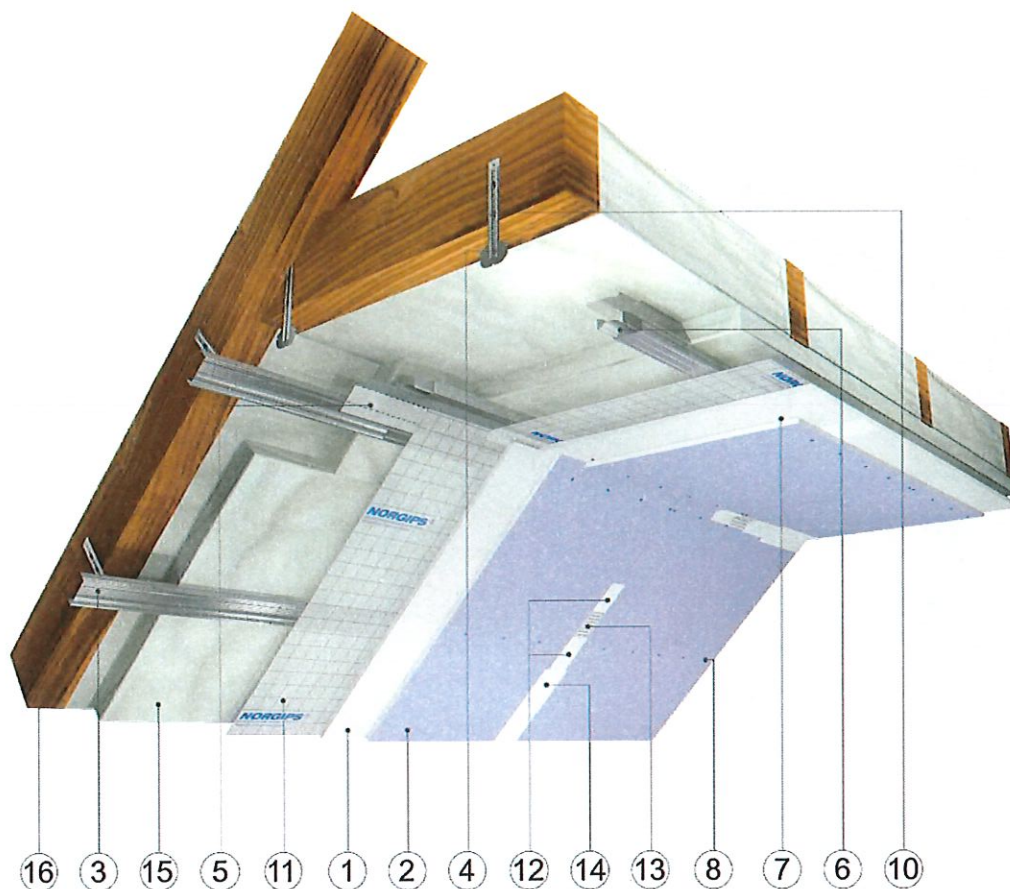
Horizontal section of the roof casing with the framework made of hat profiles
